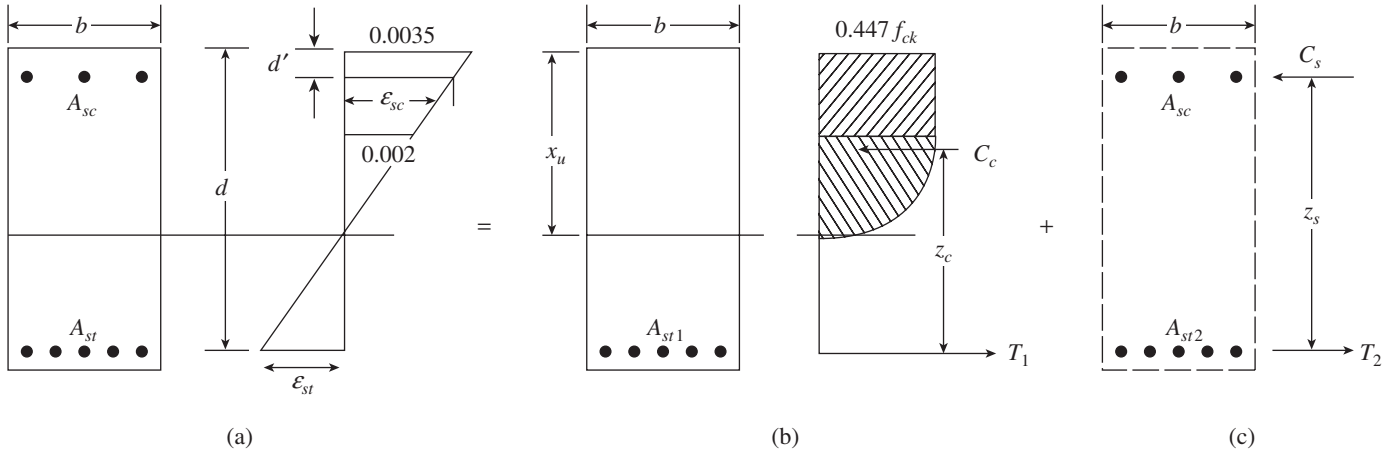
Design of doubly reinforced rectangular section (a) Beam section (b) Strain (c) Stresses
